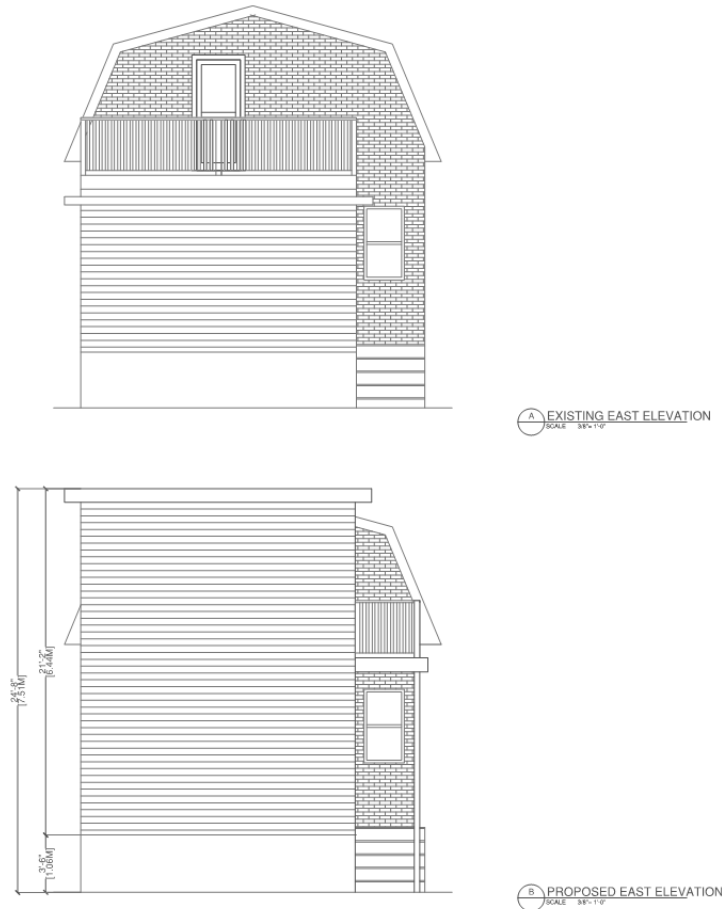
Existing and Proposed East Elevation Showing Extent of Deck into Interior Side Yard
